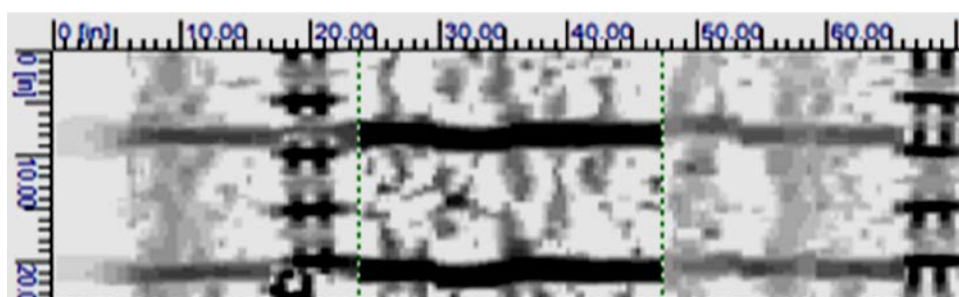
Blockscan of bottom face of interior beam (Bridge 8825).
